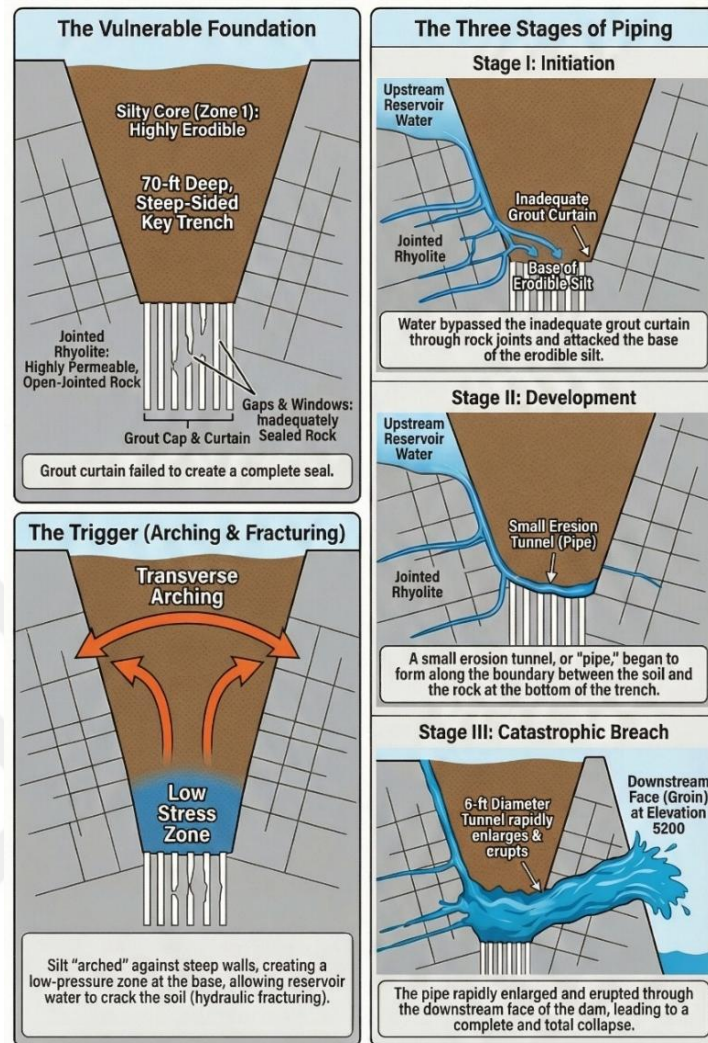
Schematic cross-section of Teton Dam illustrating the failure mechanism: piping through the key trench and the inadequate grout curtain in the jointed rhyolite foundation (Seed and Duncan, 1981; [http-33⁵¹](#))
